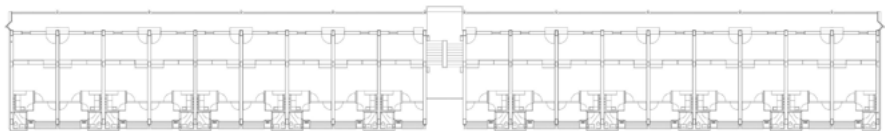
Resettlement Housing of Ilha Verde Area. Floor Plan. Own elaboration based on CD-FAUP.
